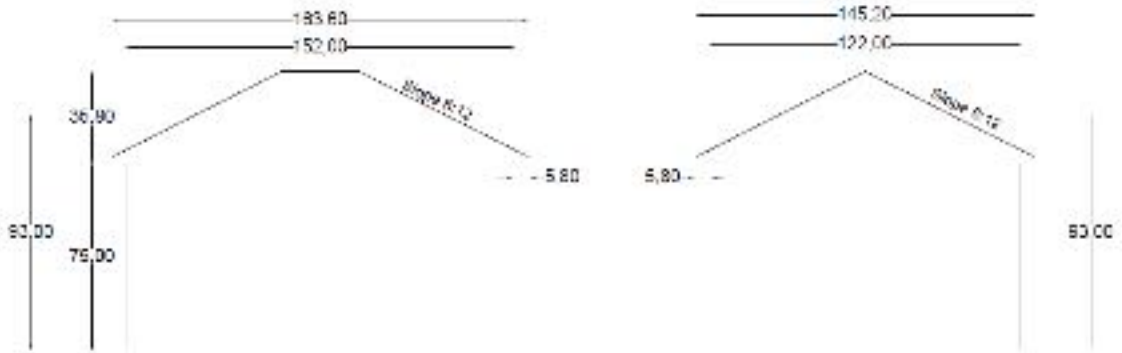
5: Model D layout (a) Elevation View (b) Side View (all dimensions are at model-scale in cm)
